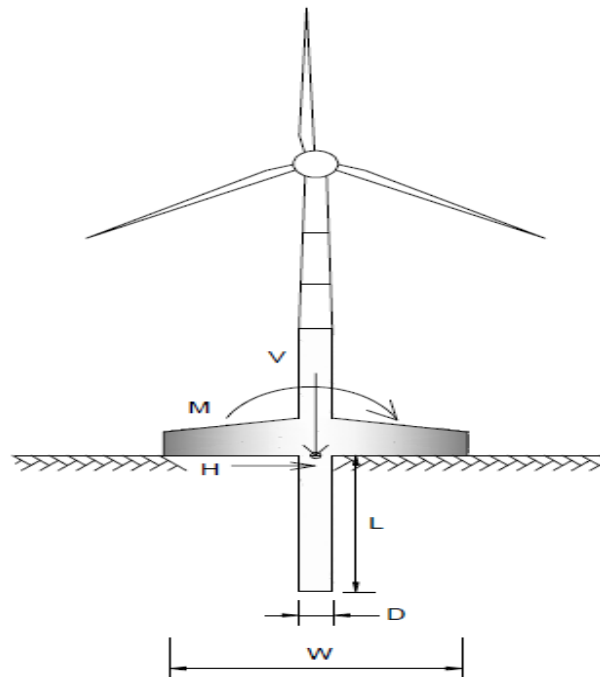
Proposed foundation system (El Marassi, 2011)
